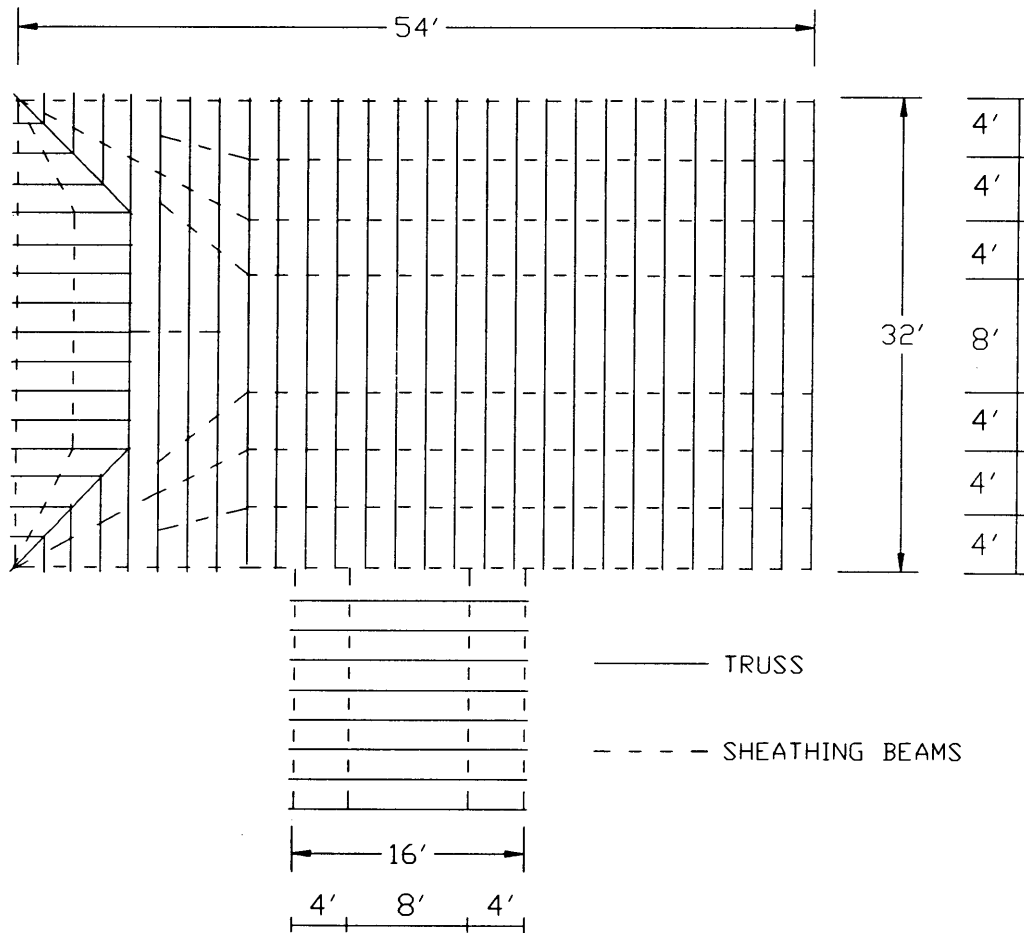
Actual Roof Truss Assembly with Sheathing Beam Elements
